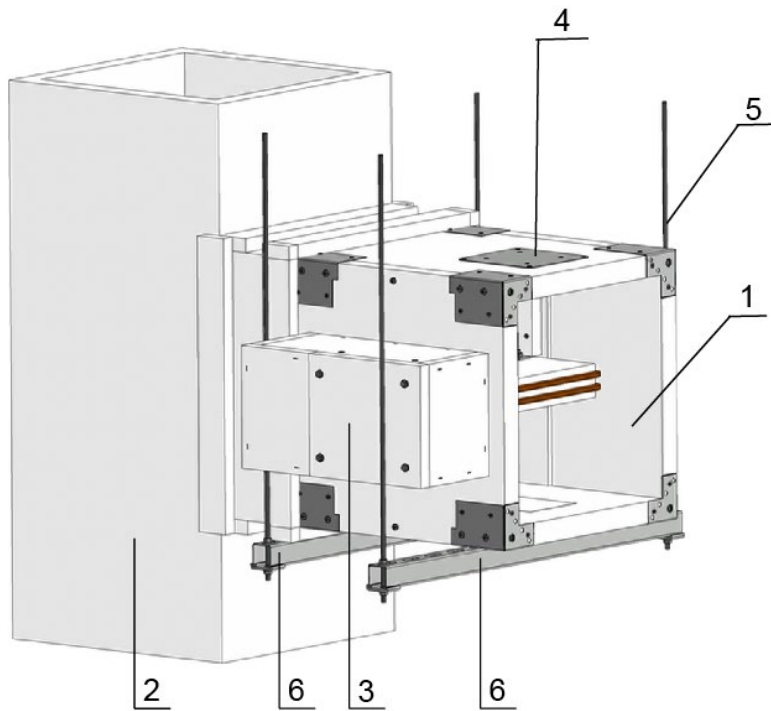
Installation to the side of vertical duct with blade and spindle in horizontal position.
